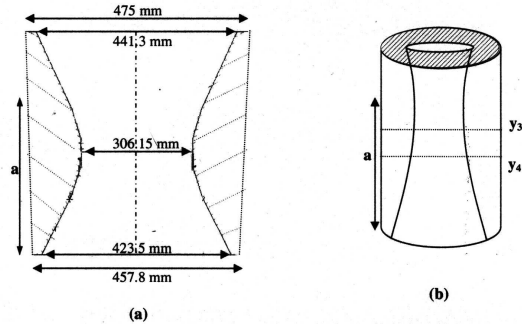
(a) AUTOCAD drawing of the specimen (b) Schematic view of model used for simulation
